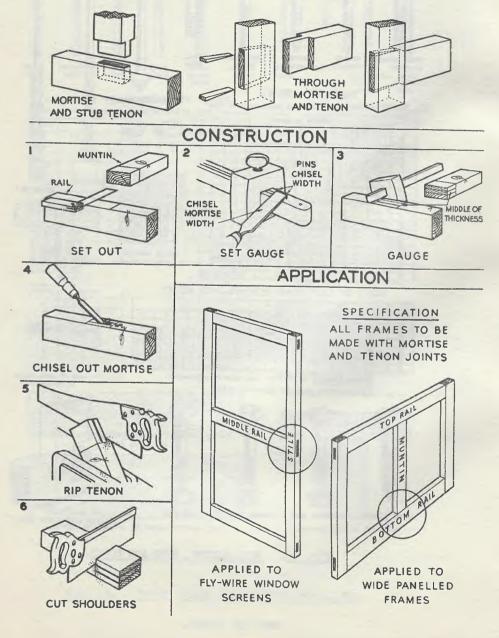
CONSTRUCTION AND APPLICATION OF MORTISE AND TENON JOINTS.
